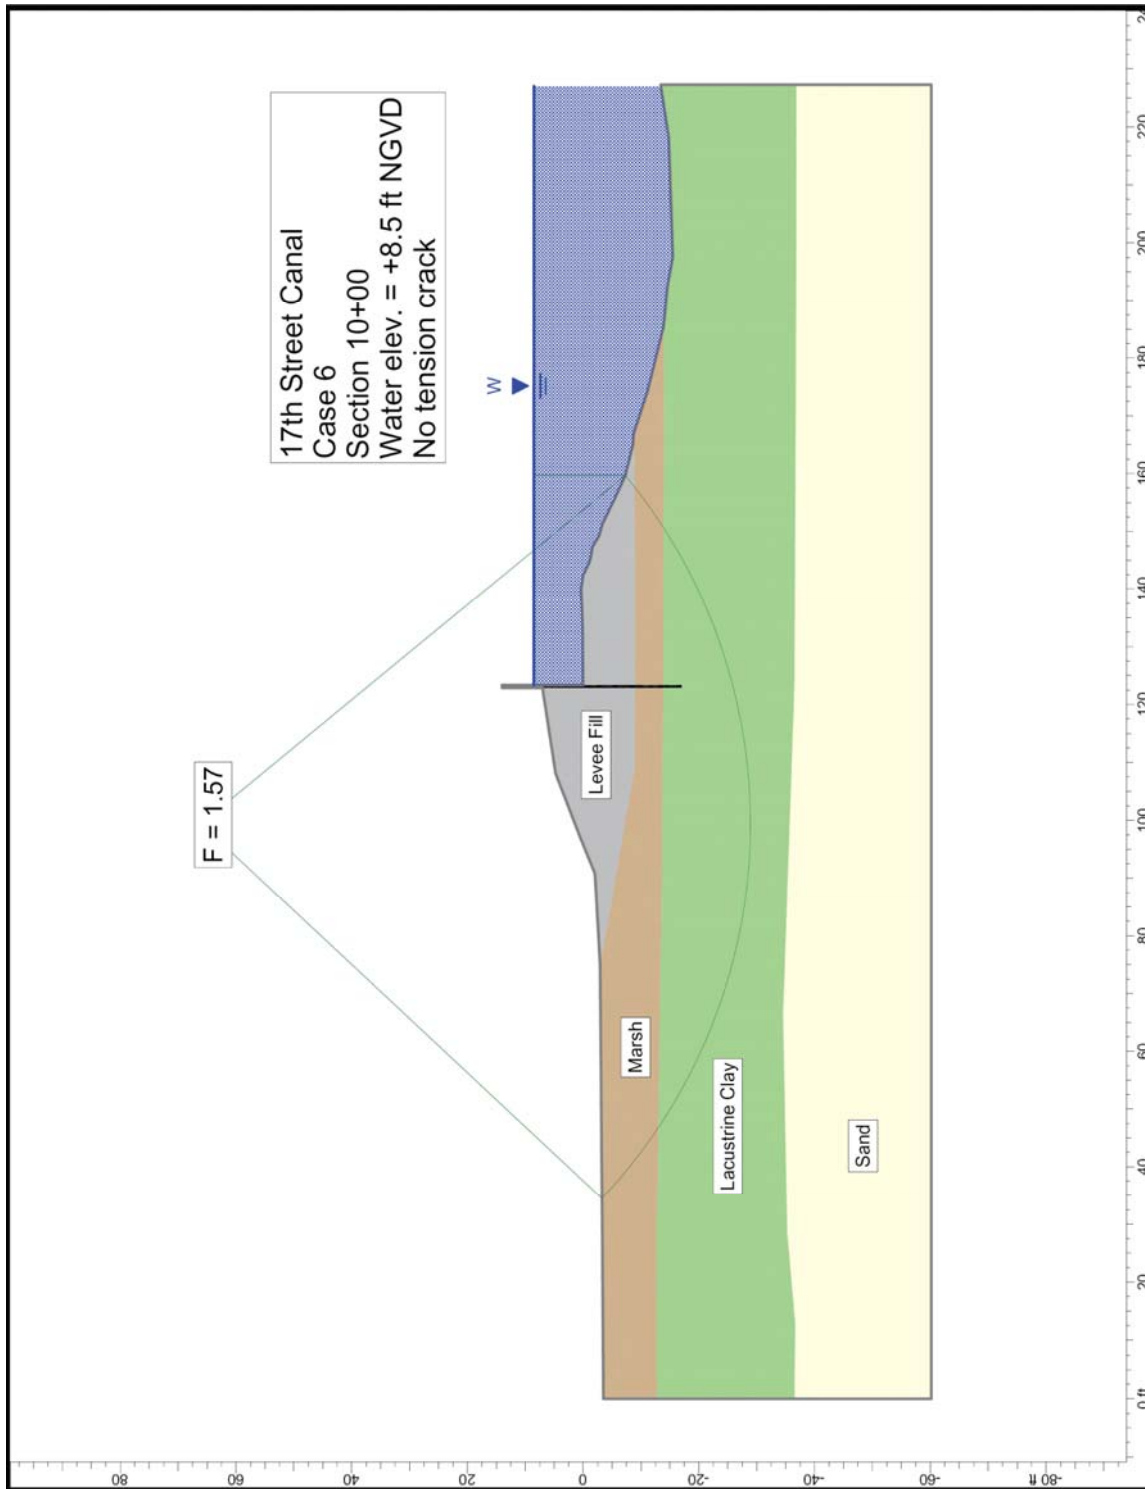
Critical circle for 17th Street Canal Station 10+00 – water elevation 8.5 ft, no tension crack.
